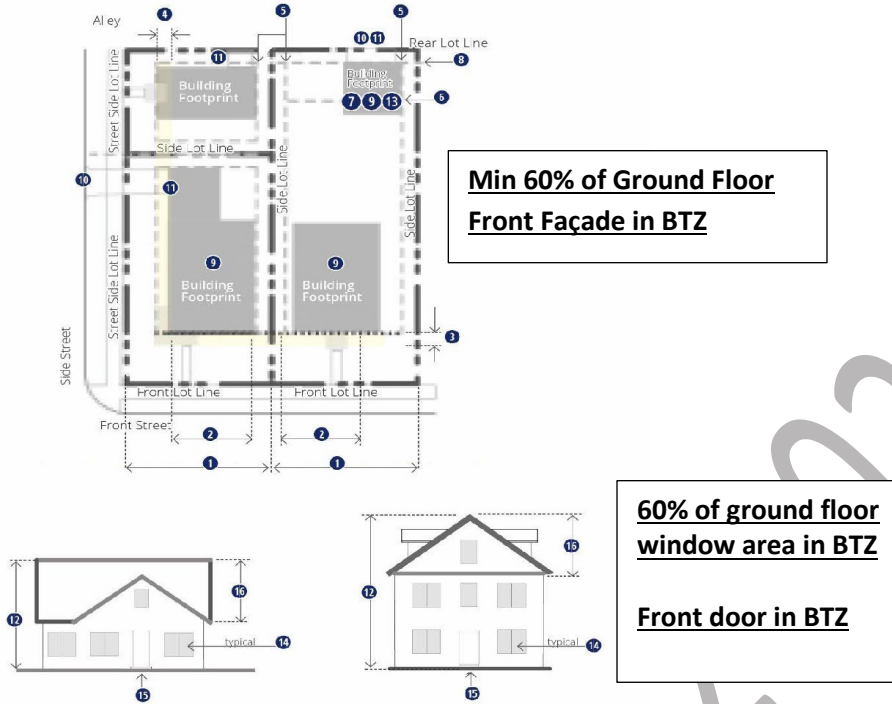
(1). N1 district diagrammatic plans and elevations.
